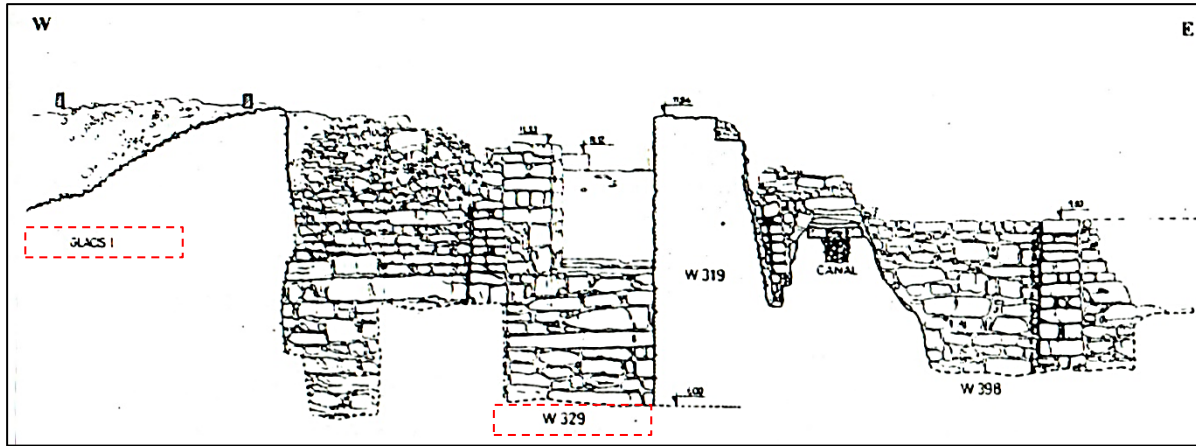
Section east-west in the second fortification wall (W329) in Beirut -Bey 003, (Badre 1997: 27).
